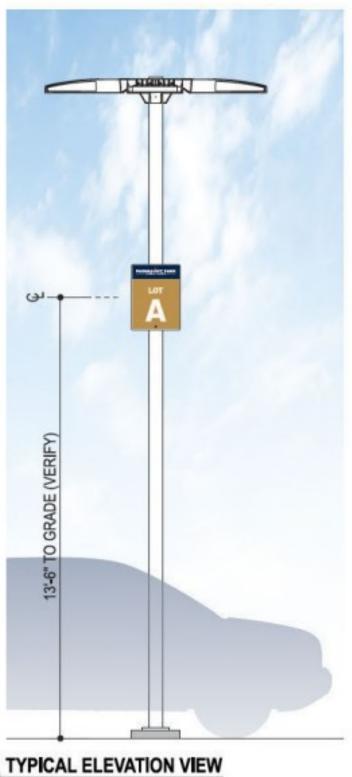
### EXHIBIT A: PROPOSED SIGNAGE DETAILS
